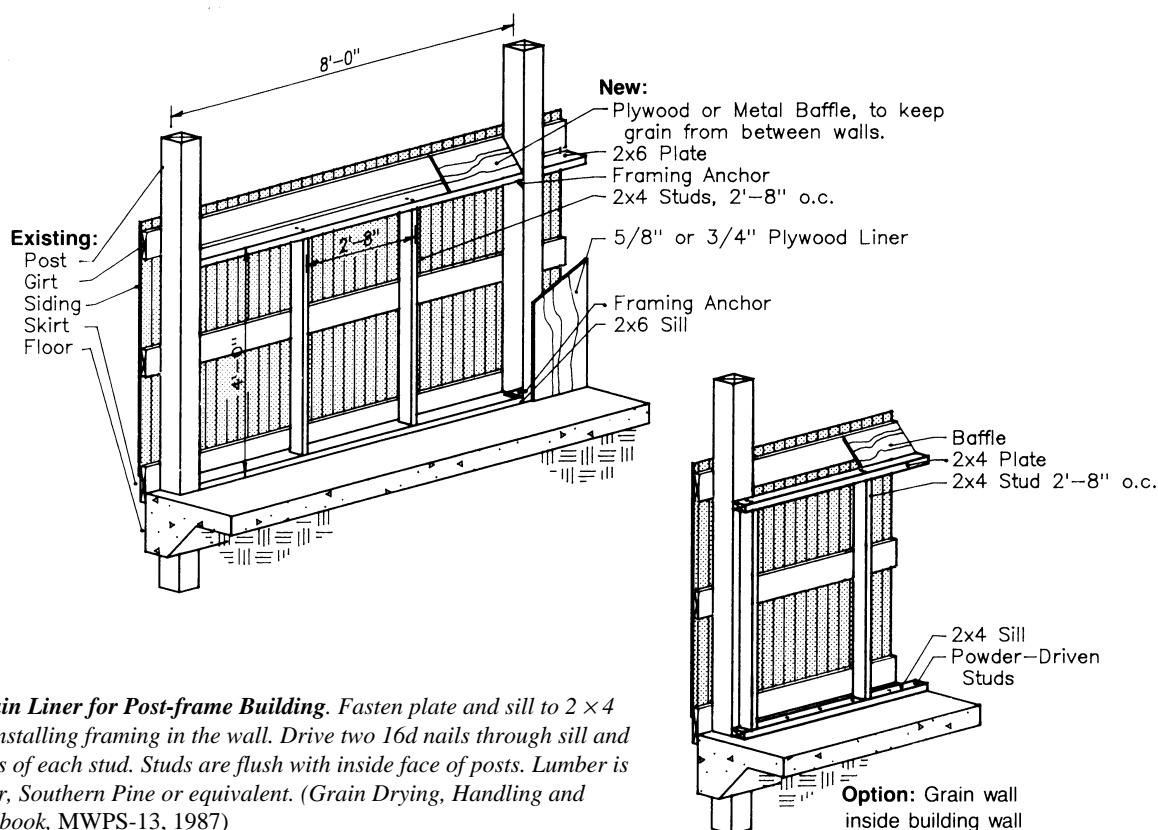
Grain Liner for Post-frame Building. Fasten plate and sill to 2 × 4 studs before installing framing in the wall. Drive two 16d nails through sill and plate into ends of each stud. Studs are flush with inside face of posts. Lumber is No. 2 or better, Southern Pine or equivalent. (Grain Drying, Handling and Storage Handbook, MWPS-13, 1987)
